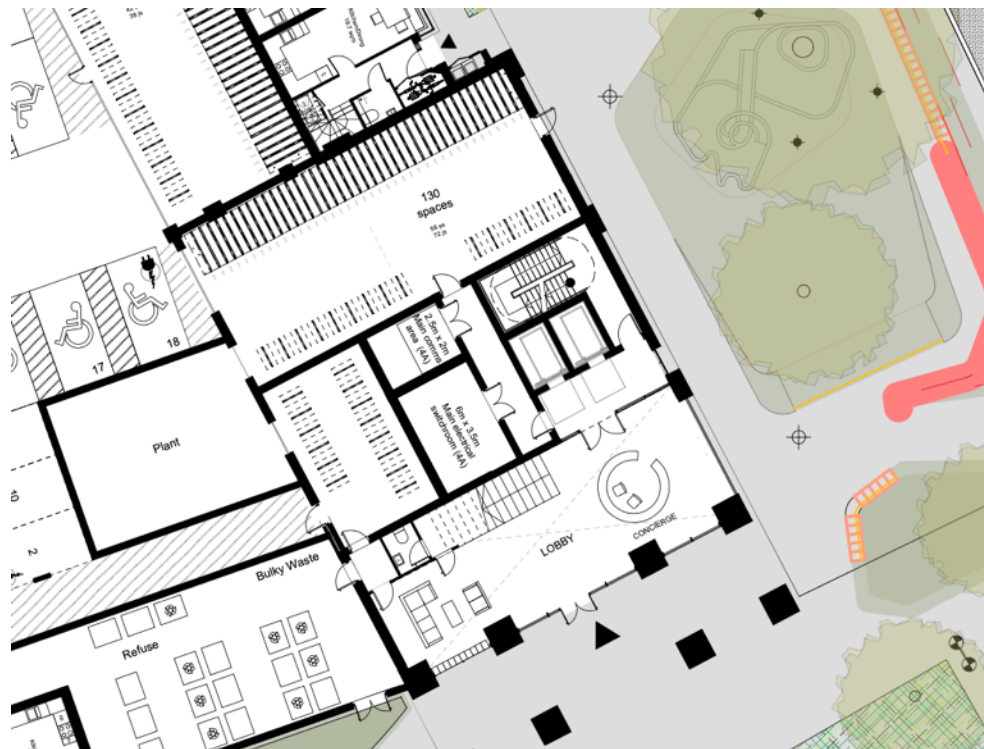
Extract from approved ground floor plan showing the corner of subplot 4
